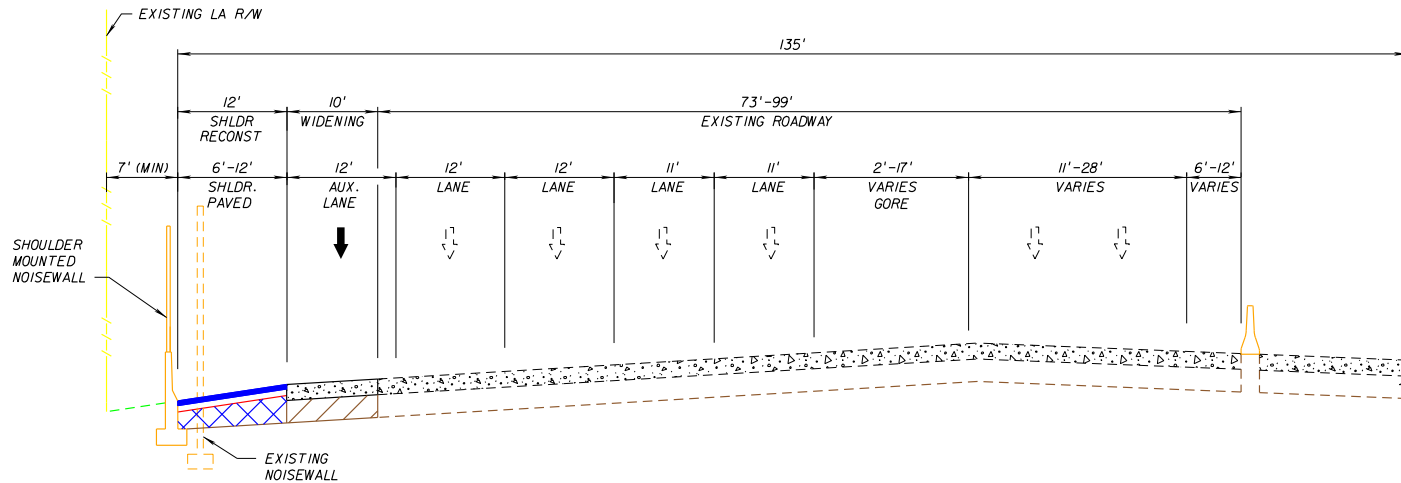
Proposed Typical Section - I-95 SB S. of Biscayne Canal - Alt. 3A and 4
